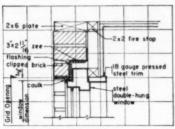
Alternate masonry head detail for steel double-hung window in the "SCR brick" wall
